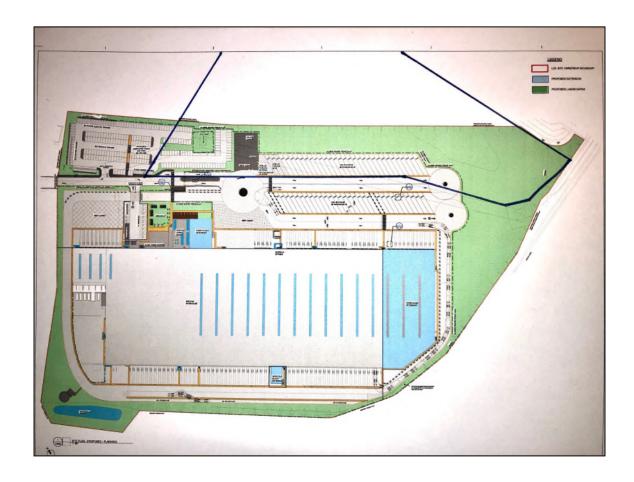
Extract of Site Layout Plan with the Boundary of the SINC in blue
